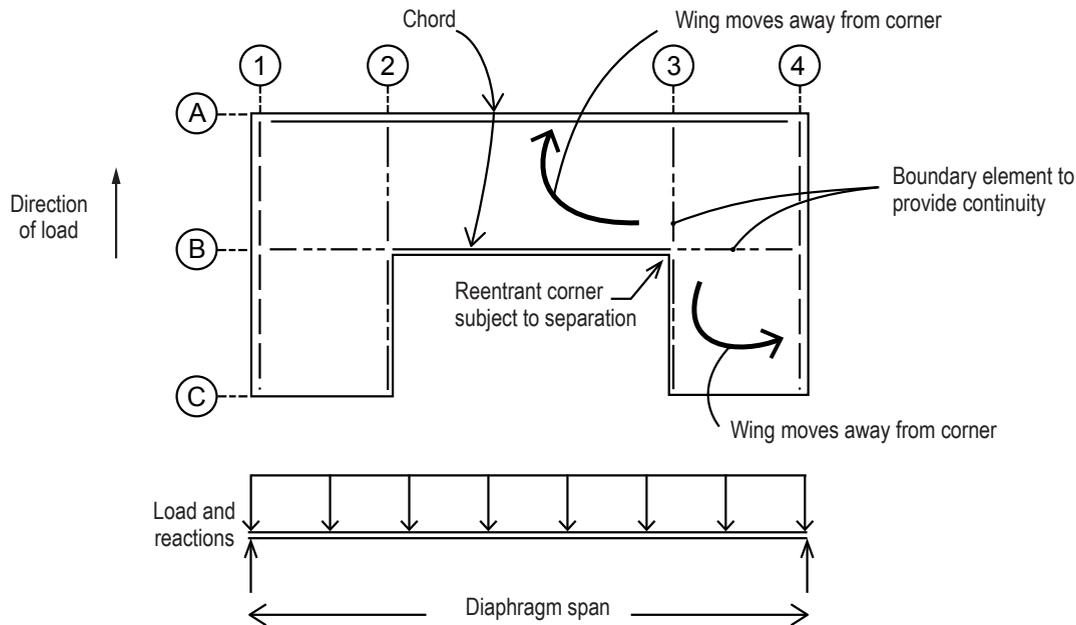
Plan view of diaphragm showing reentrant corner and potential seismic response.
